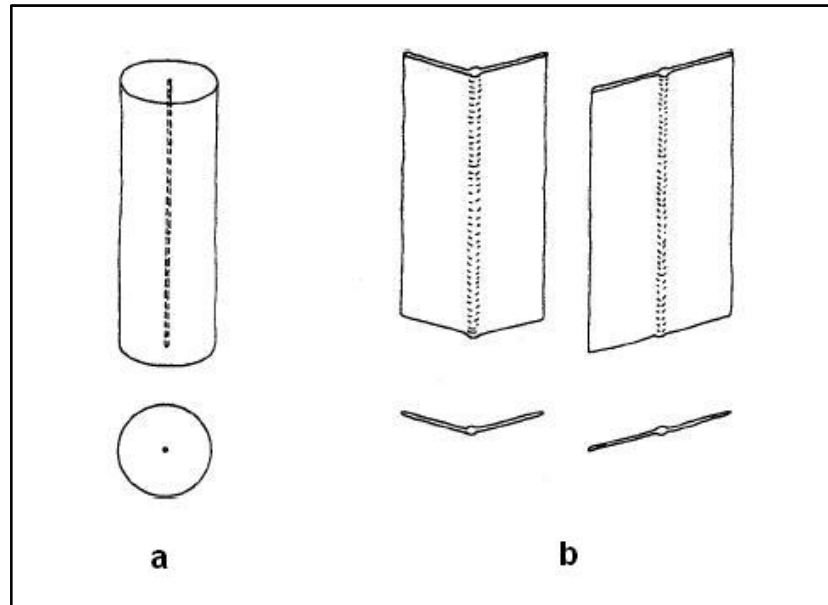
1 Jet grouted elements: (a) jet grouted column, (b) jet grouted panels
